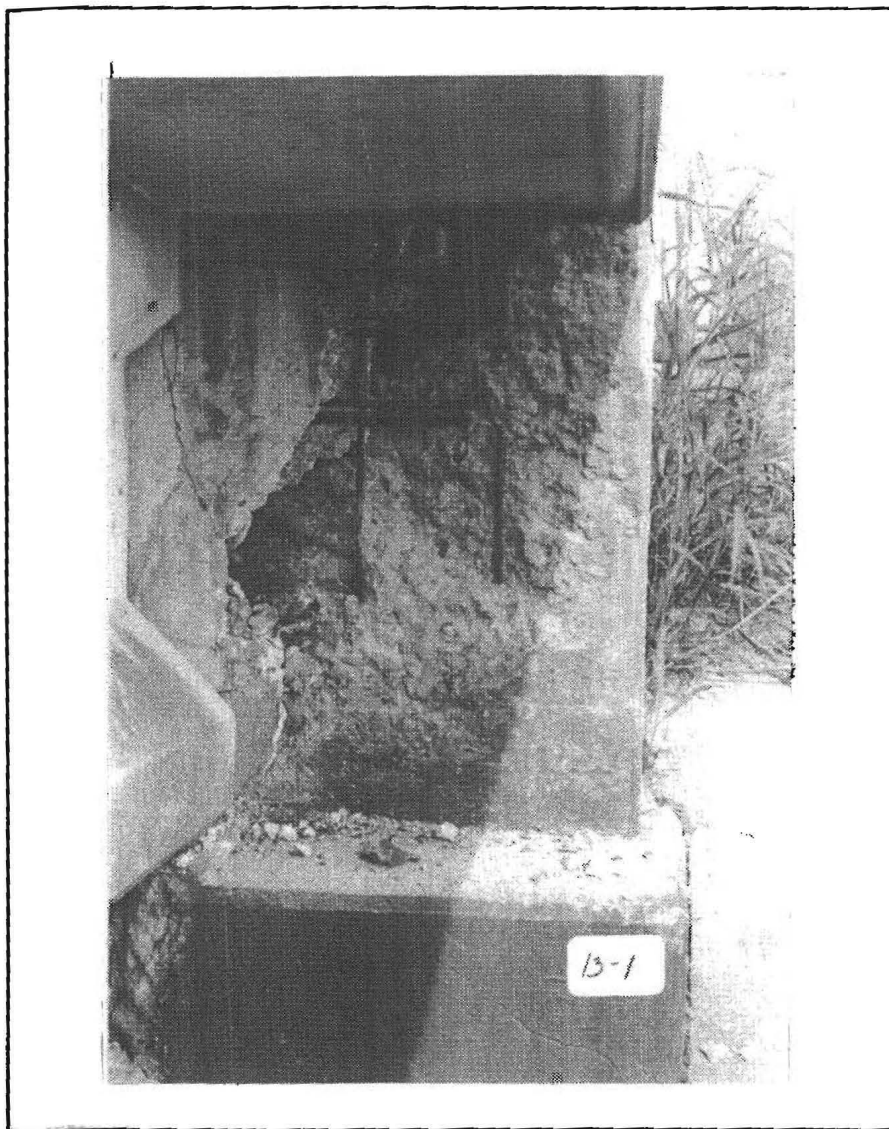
Observed Abutment Backwall Damage, Intermediate Stage (US69 at Fannet, Beaumont)
